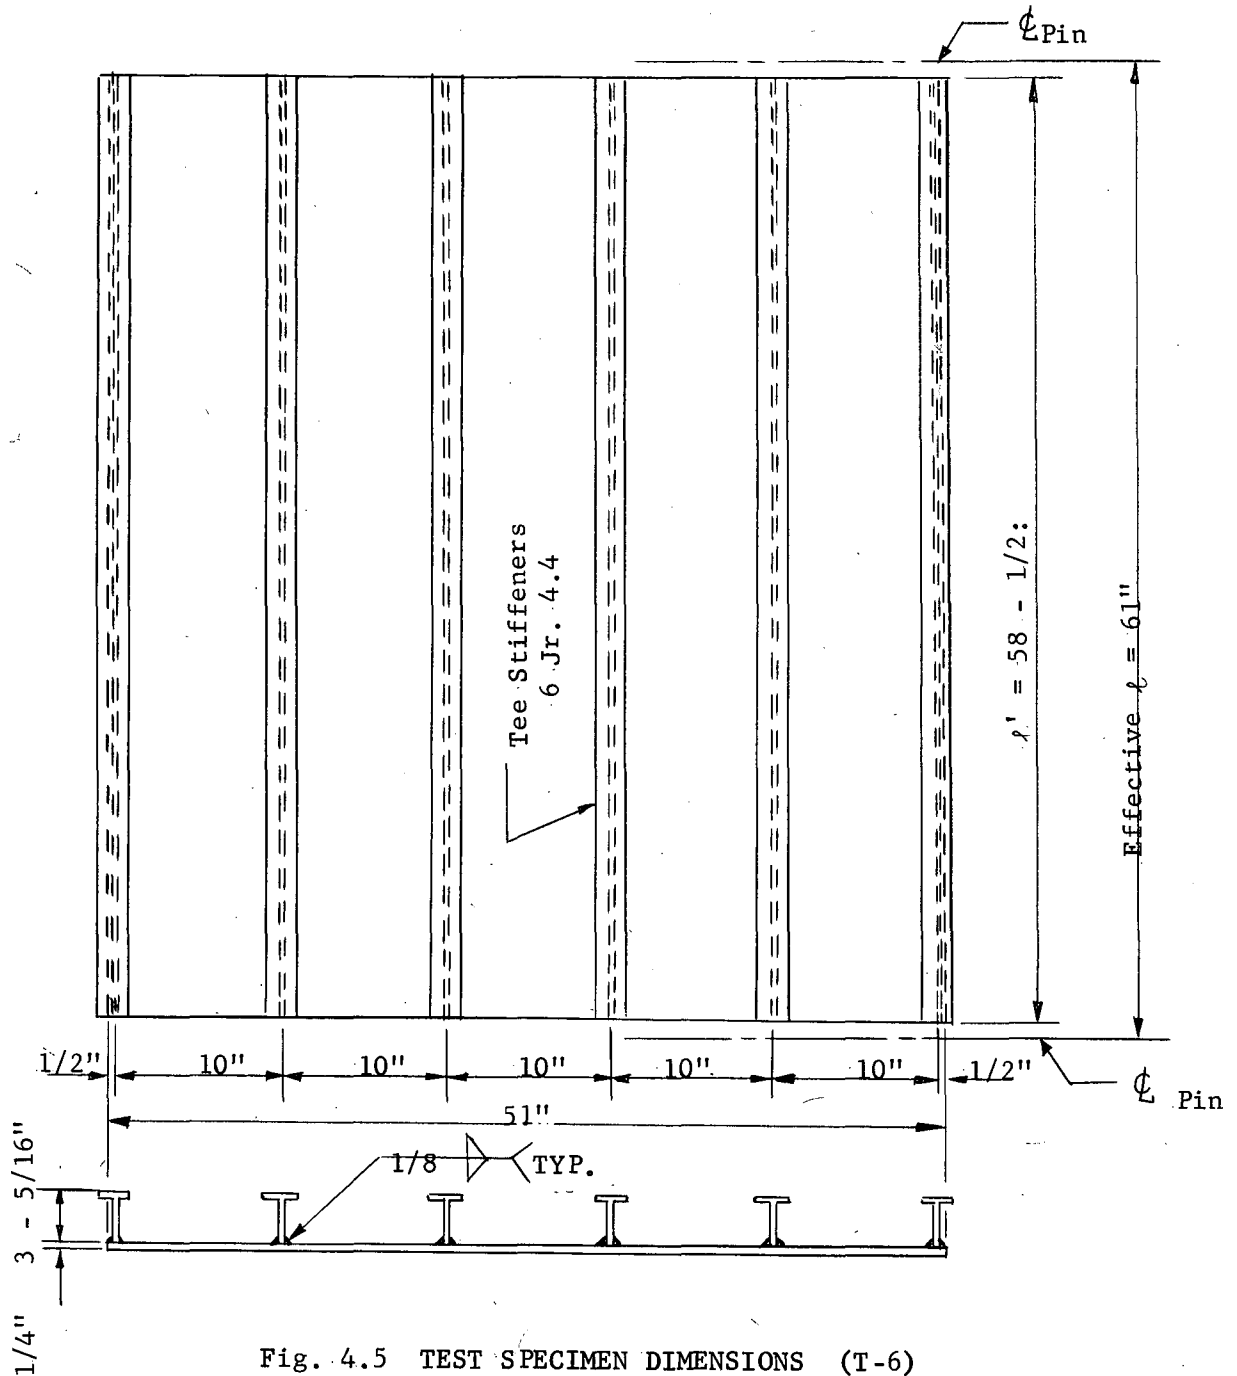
TEST SPECIMEN DIMENSIONS (T-6)
